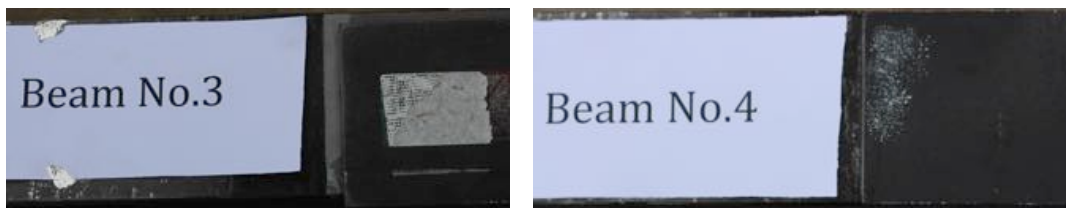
Beam no.3\_50 and 4 plate tips after testing
